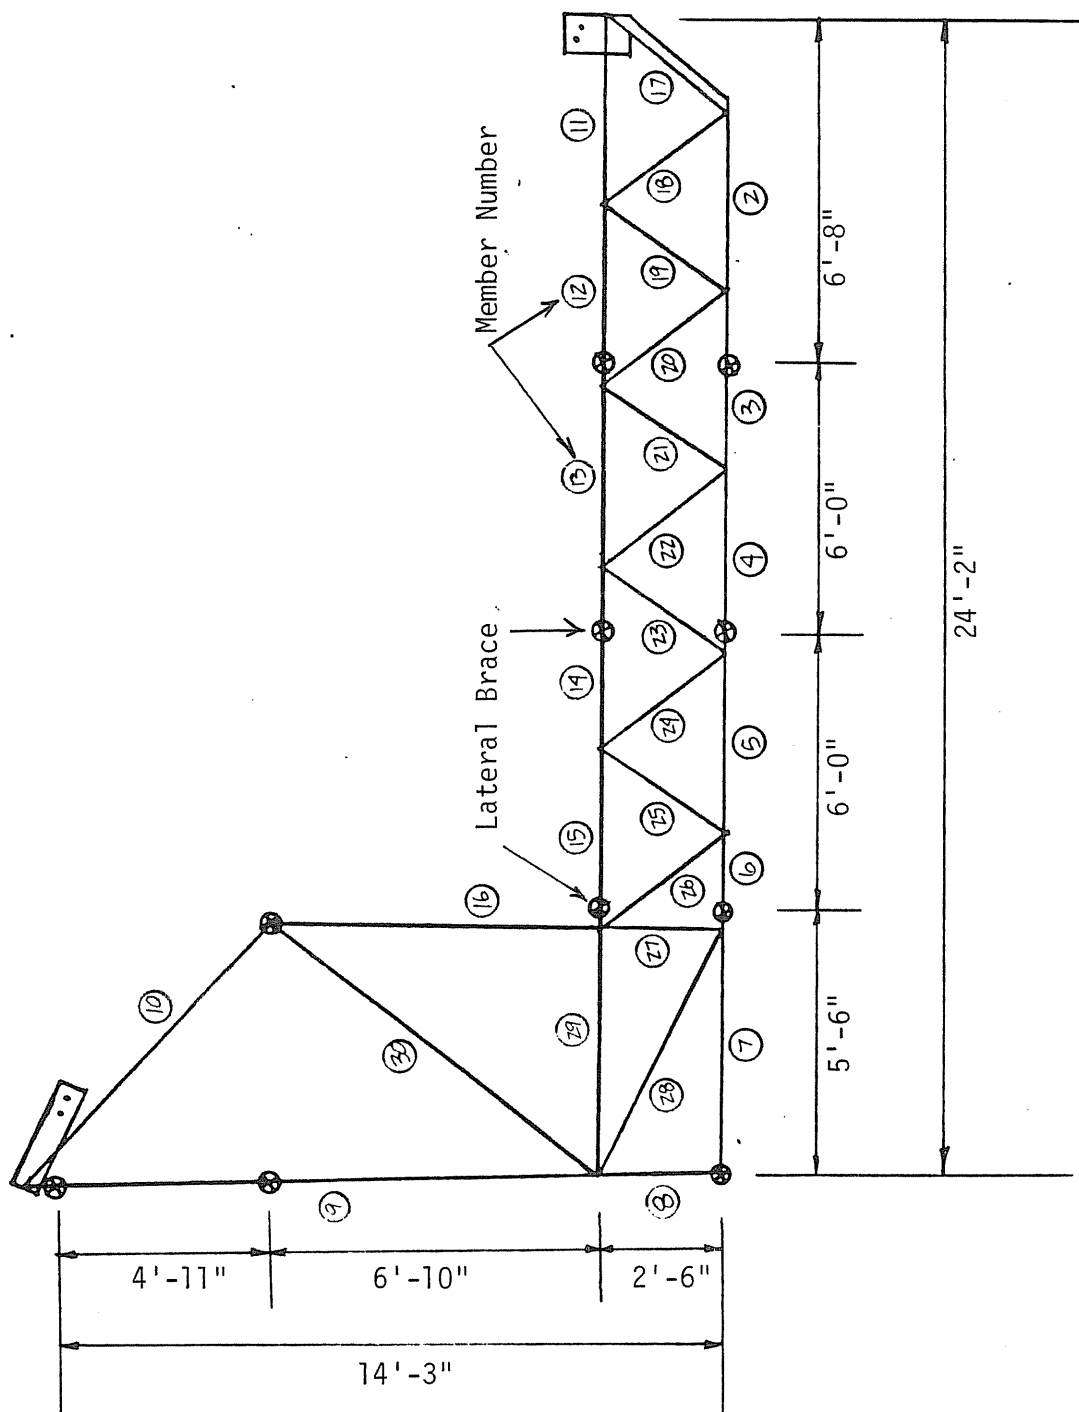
SPECIMEN MEMBER NUMBERS AND LATERAL BRACE LOCATIONS, TEST KN-6-2
